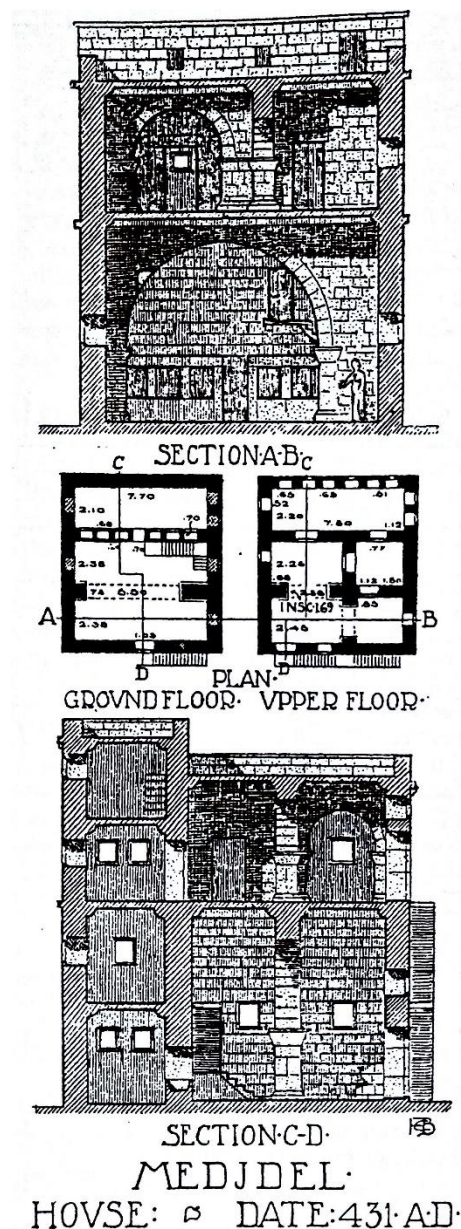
Plan and elevation of a house at il Medjdel (Syria) (Ellis 2000: 92, fig. 17).
